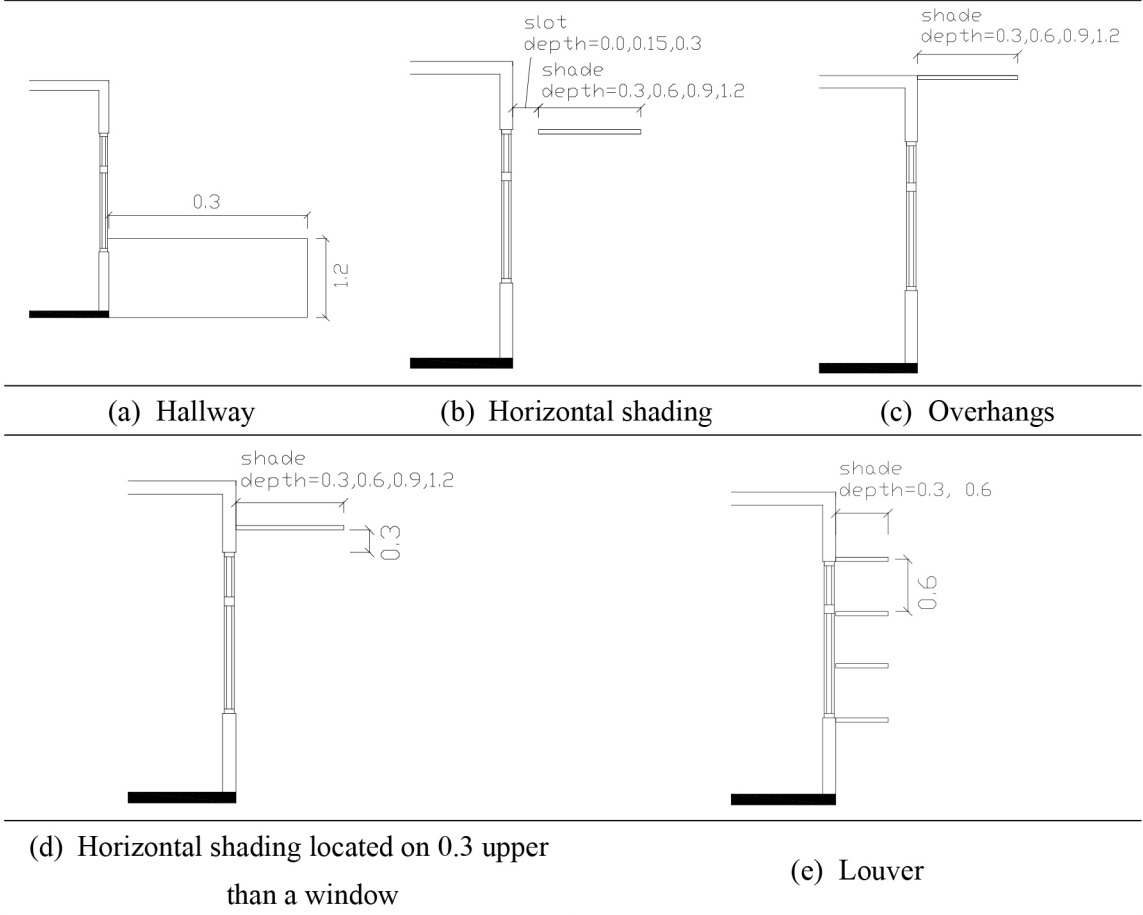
(a)–(e) Dimension of structural attachments on building façade (unit:m).
